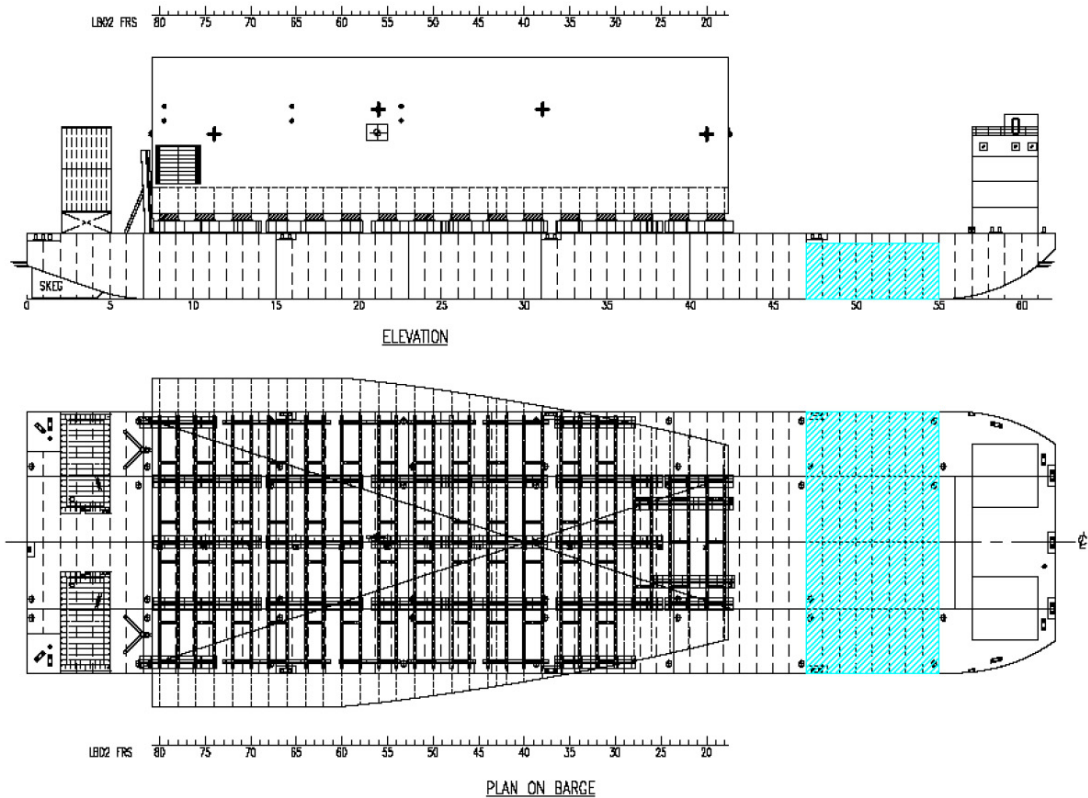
Ballast Arrangement - Elevation and Plan on BOA35
